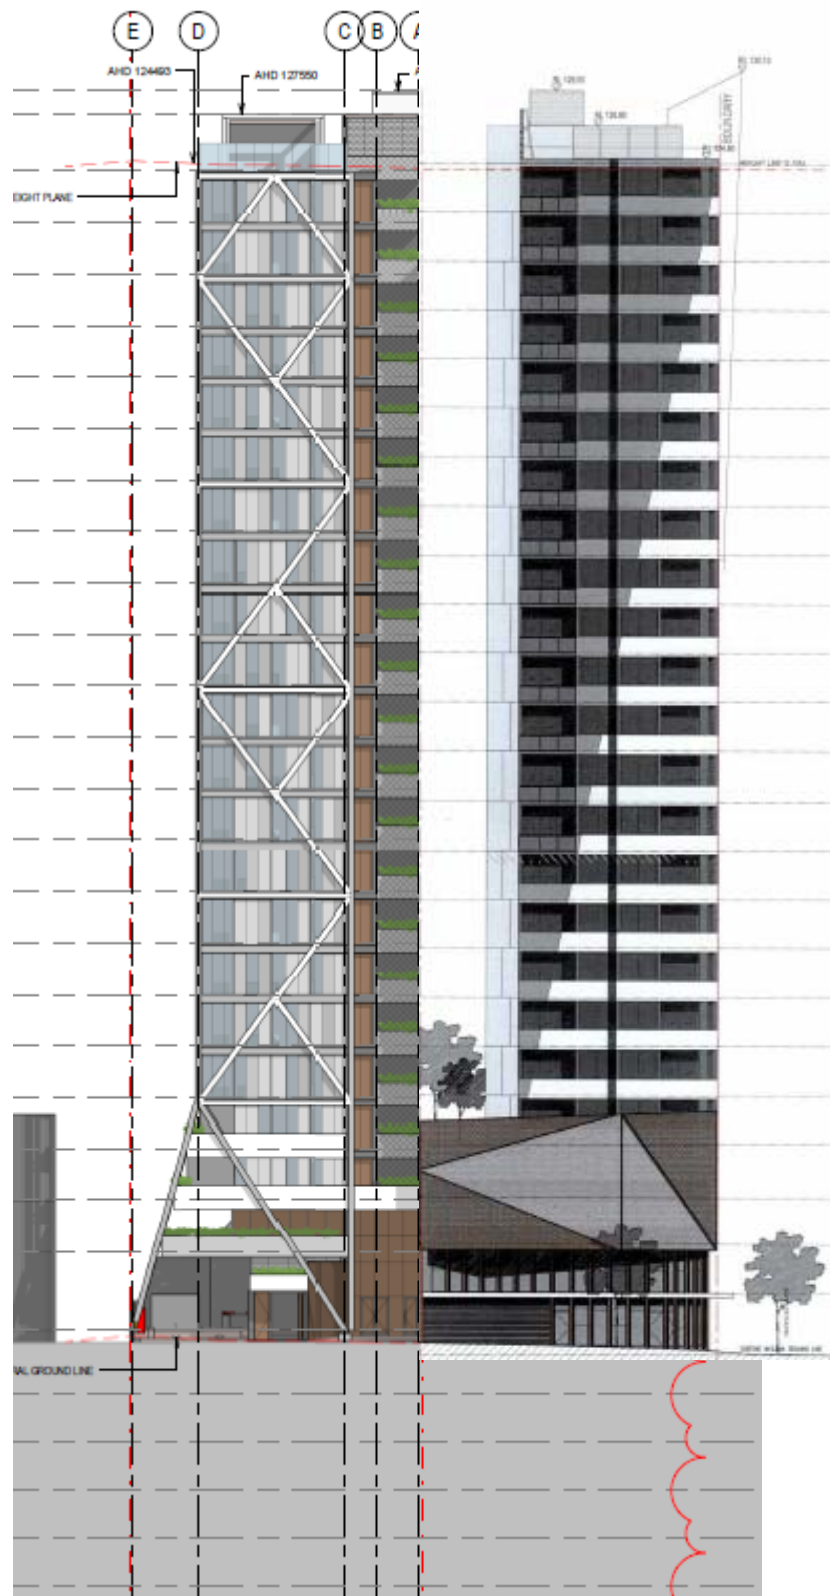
Extract from the proposed North Elevation Plan A3000 demonstrating the streetscape presentation of the proposed development (left) and the approved north elevation plan of the development currently under construction at 28 Second Avenue, Blacktown (overlaid on the right).
